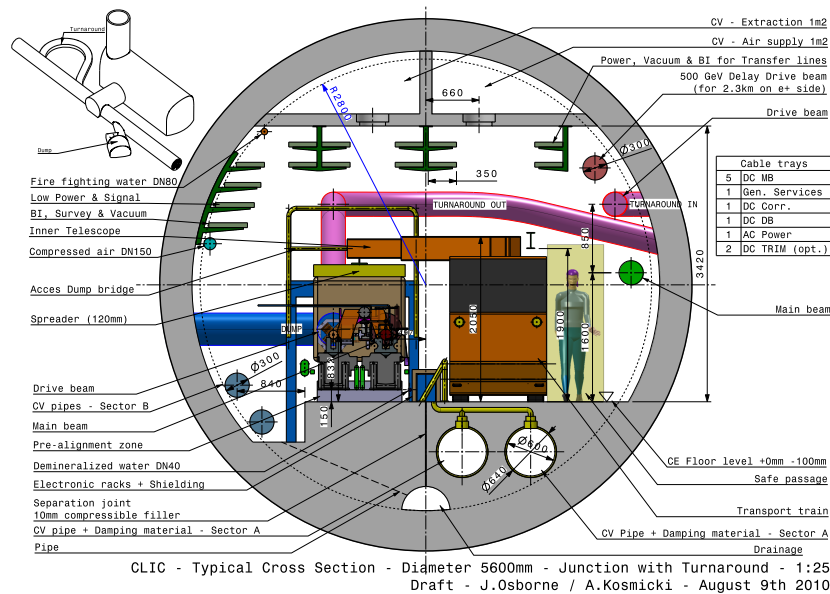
Typical tunnel cross-section: 5.6 m
